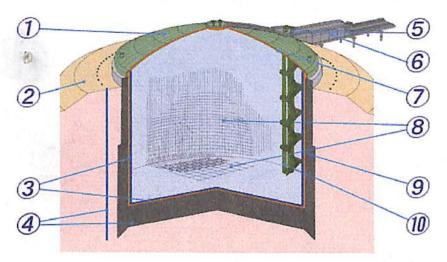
The Roof Inner Insulation Type (Without Suspended Deck)
